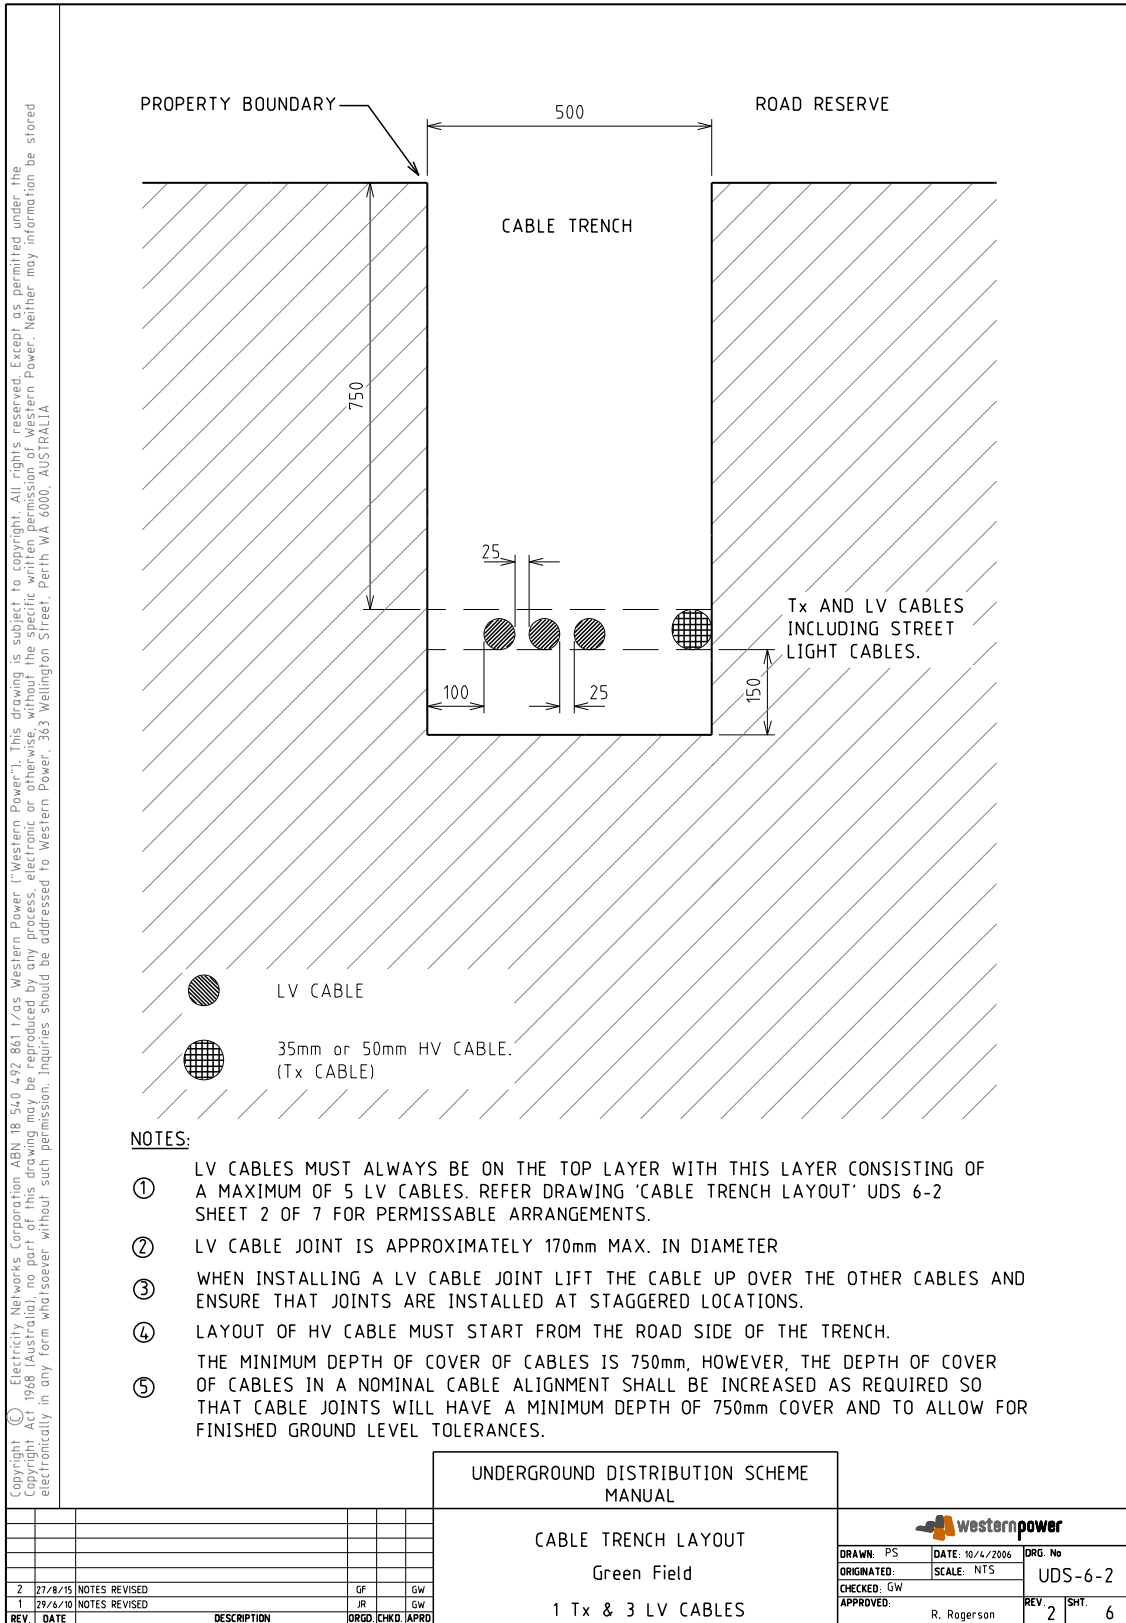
Cable Trench Layout (Sheet 6 of 7)
